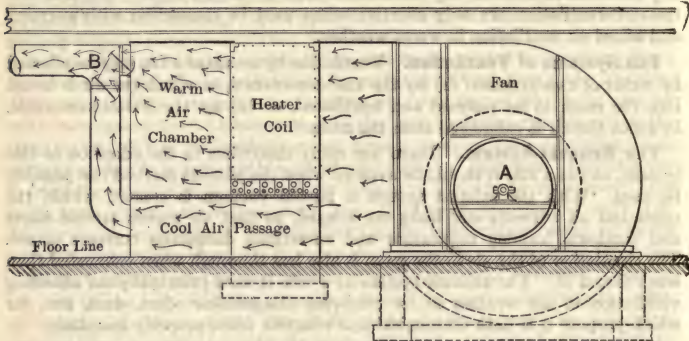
Type of Single-duct System of Fan-ventilation and Heating
